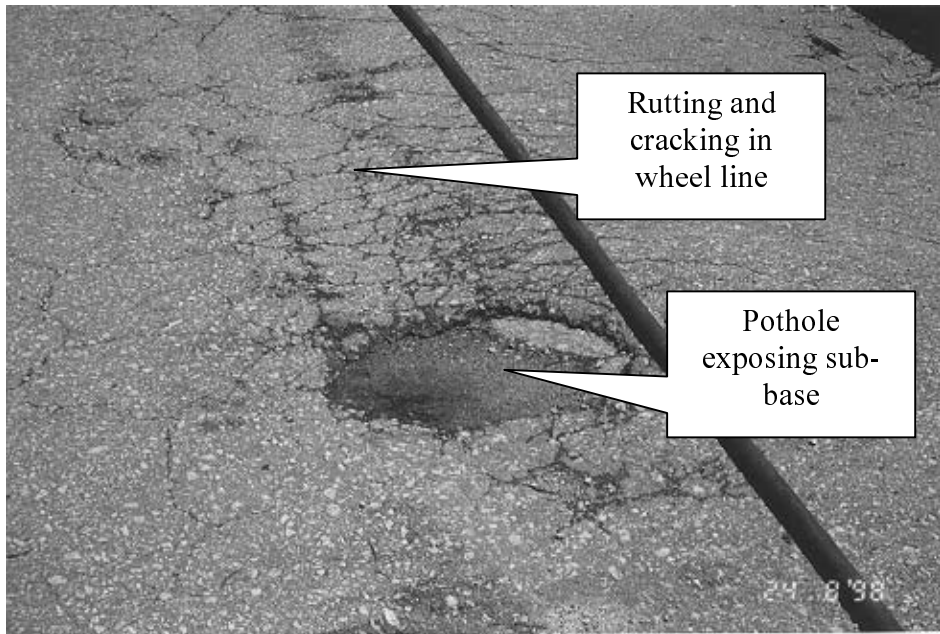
View of Condition of the Old Tai Woh Ping Road Pavement
